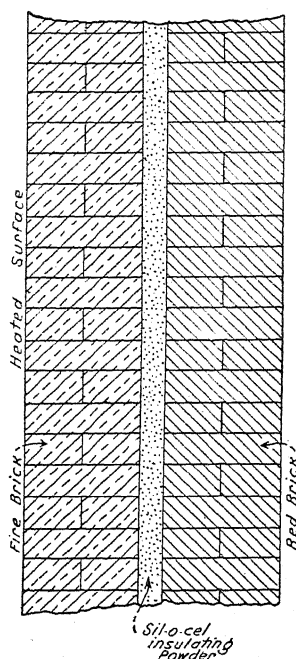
TYPICAL WALL CONSTRUCTION, SHOWING INSULATING POWDER IN HOLLOW WALL.
